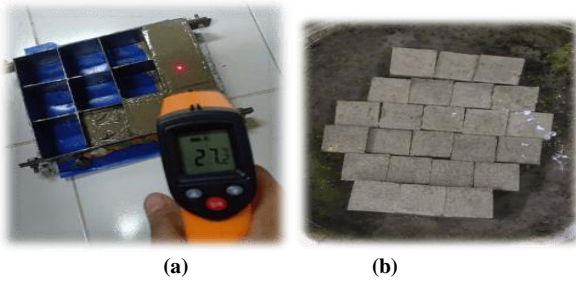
(a) Casting of Cube Specimen (b) Curing of cube specimen by soaking in water
